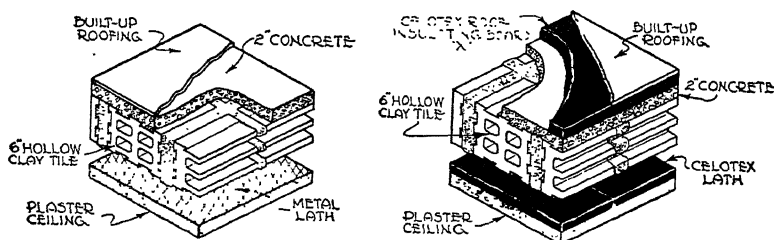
Typical Roof Insulation on Hollow Clay Tile Construction
